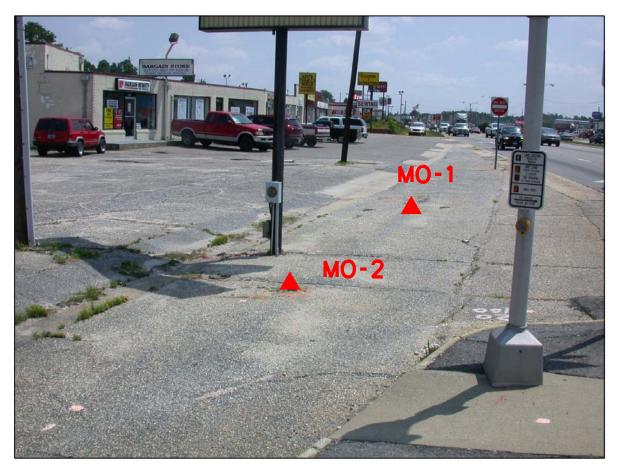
BORINGS IN PROPOSED R/W LOOKING SOUTH
